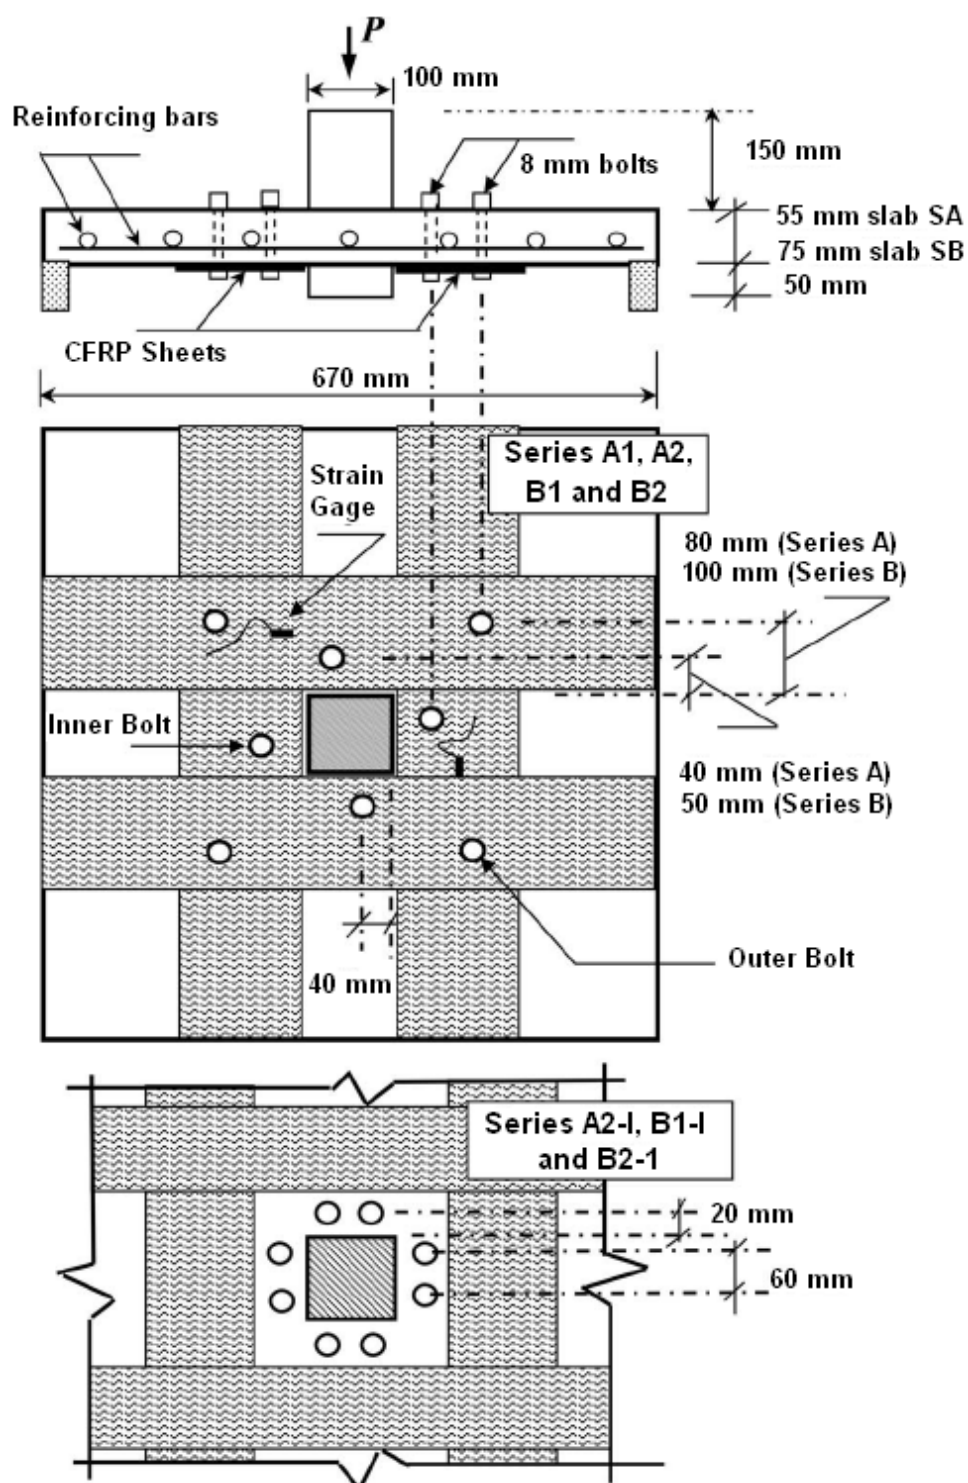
Specimen dimension and reinforcement details; Ref. [55].
